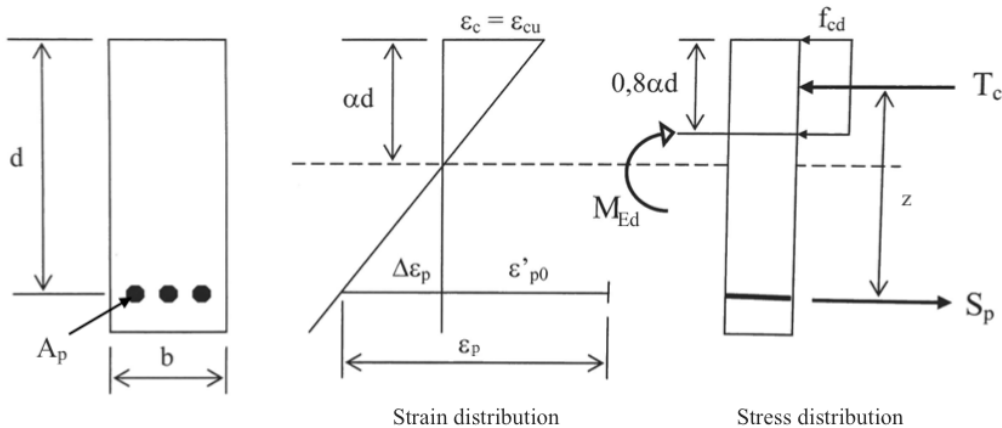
Cross-section with prestressing steel in tensile zone [10]
